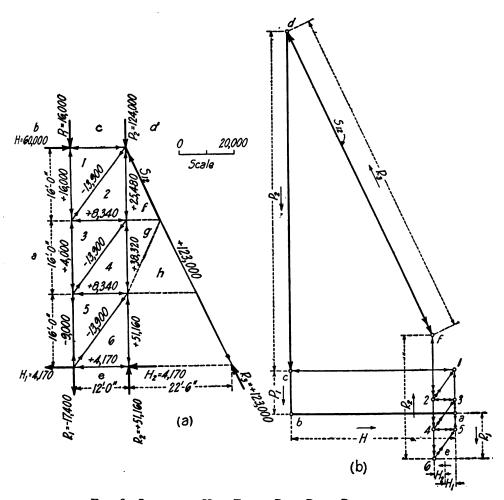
STRESSES IN HEAD FRAME, BACK BRACE REDUNDANT.
